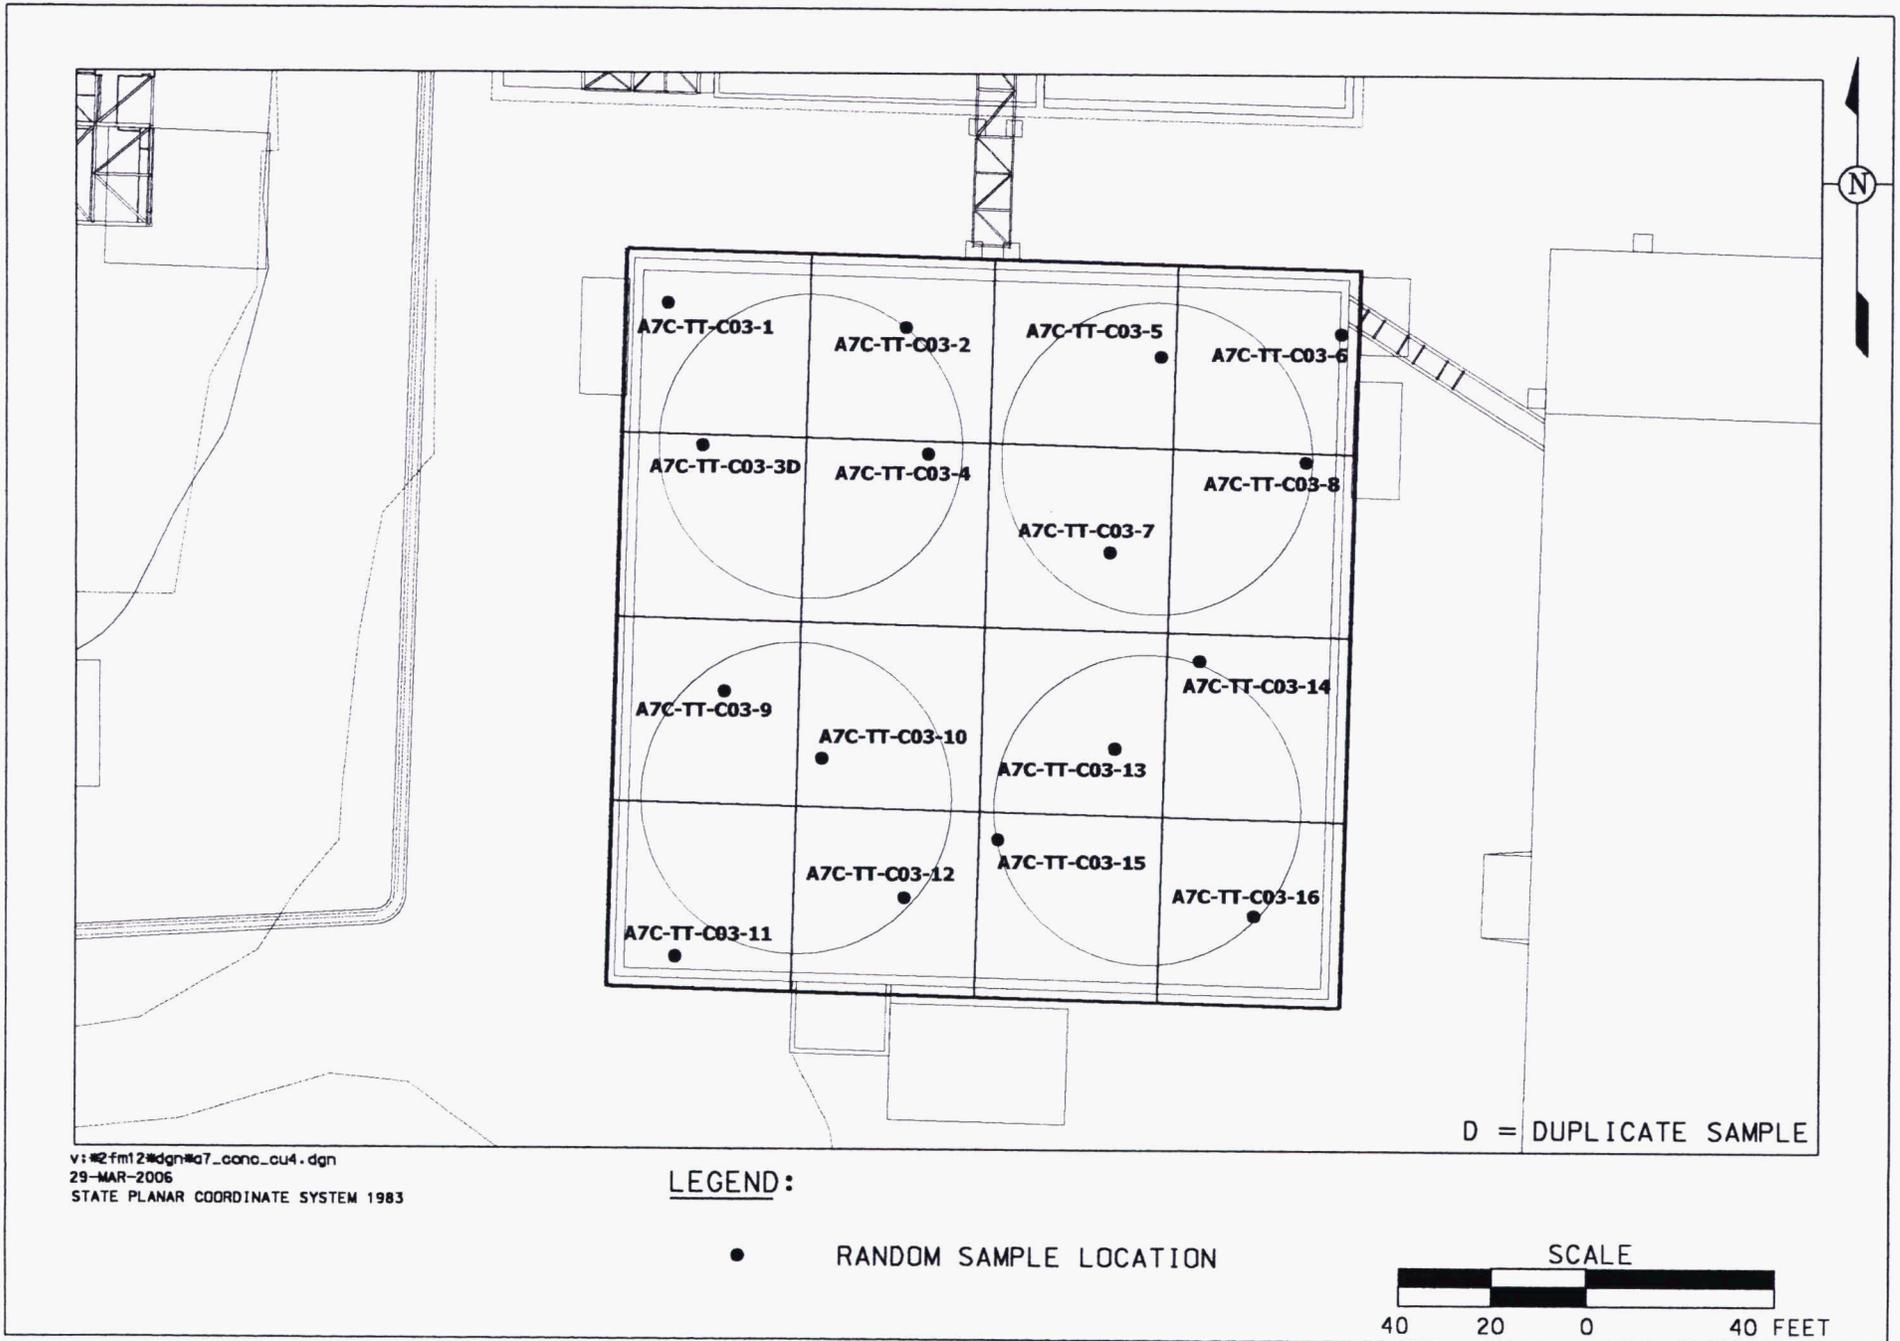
TTA BUILDING SECOND FLOOR DECK - CERTIFICATION UNIT RANDOM SAMPLE LOCATIONS
